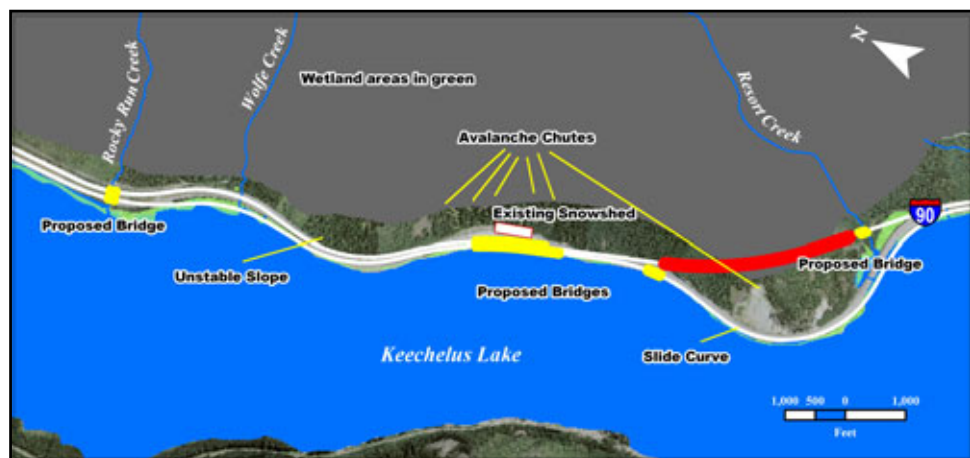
Keechelus Lake Alignment Alternative 3 - Short Tunnel Westbound, No Tunnel Eastbound
